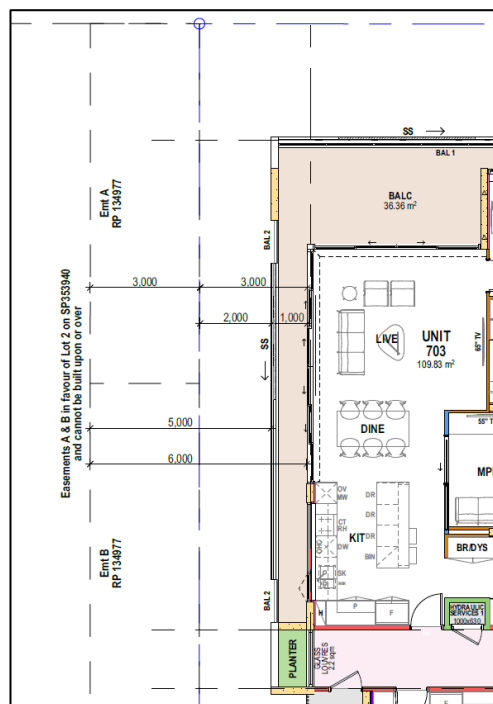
Diagram showing location of easements on adjoining site and proposed setbacks
